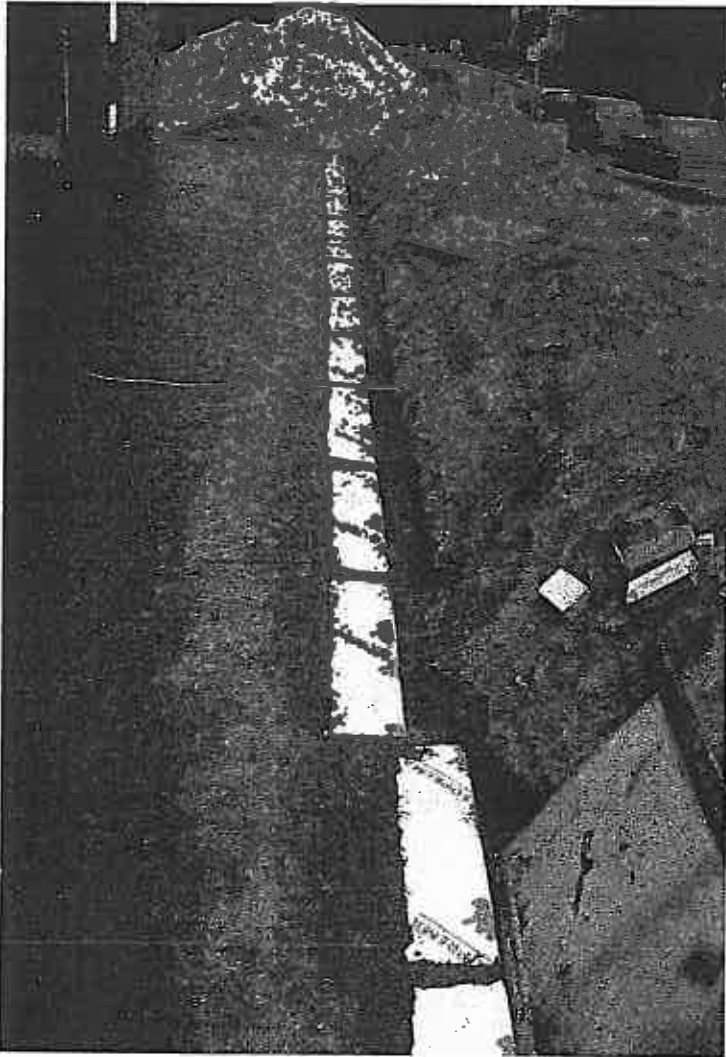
Looking in a westerly direction along the slab and wall intersection, a peel-and-stick membrane has been installed at the edge at the wall and slab intersection.
